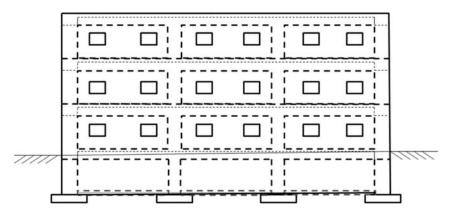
Base at Foundation Level Where There are Full-Length Exterior Shear Walls.
